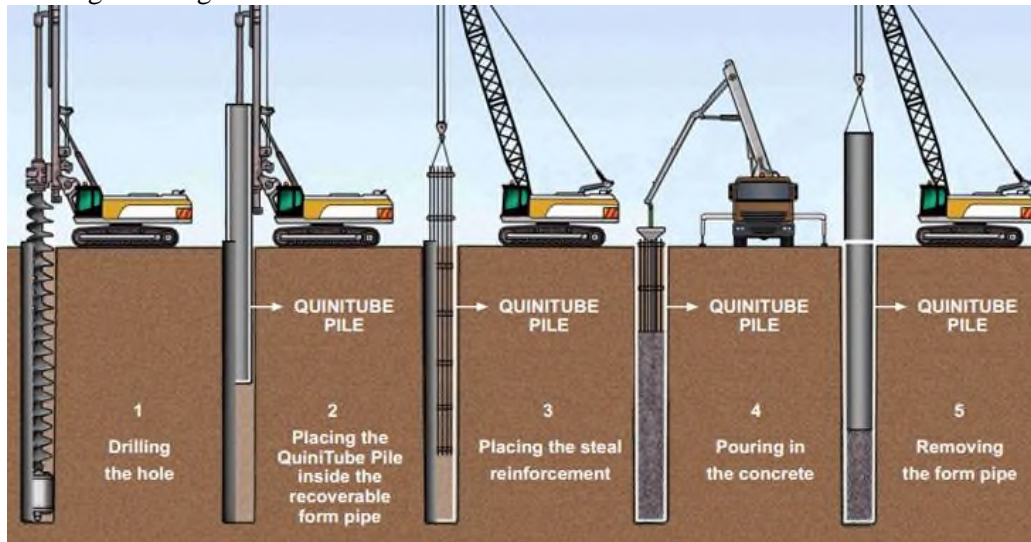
Manufacturing technology of the pile foundation at the construction site.
